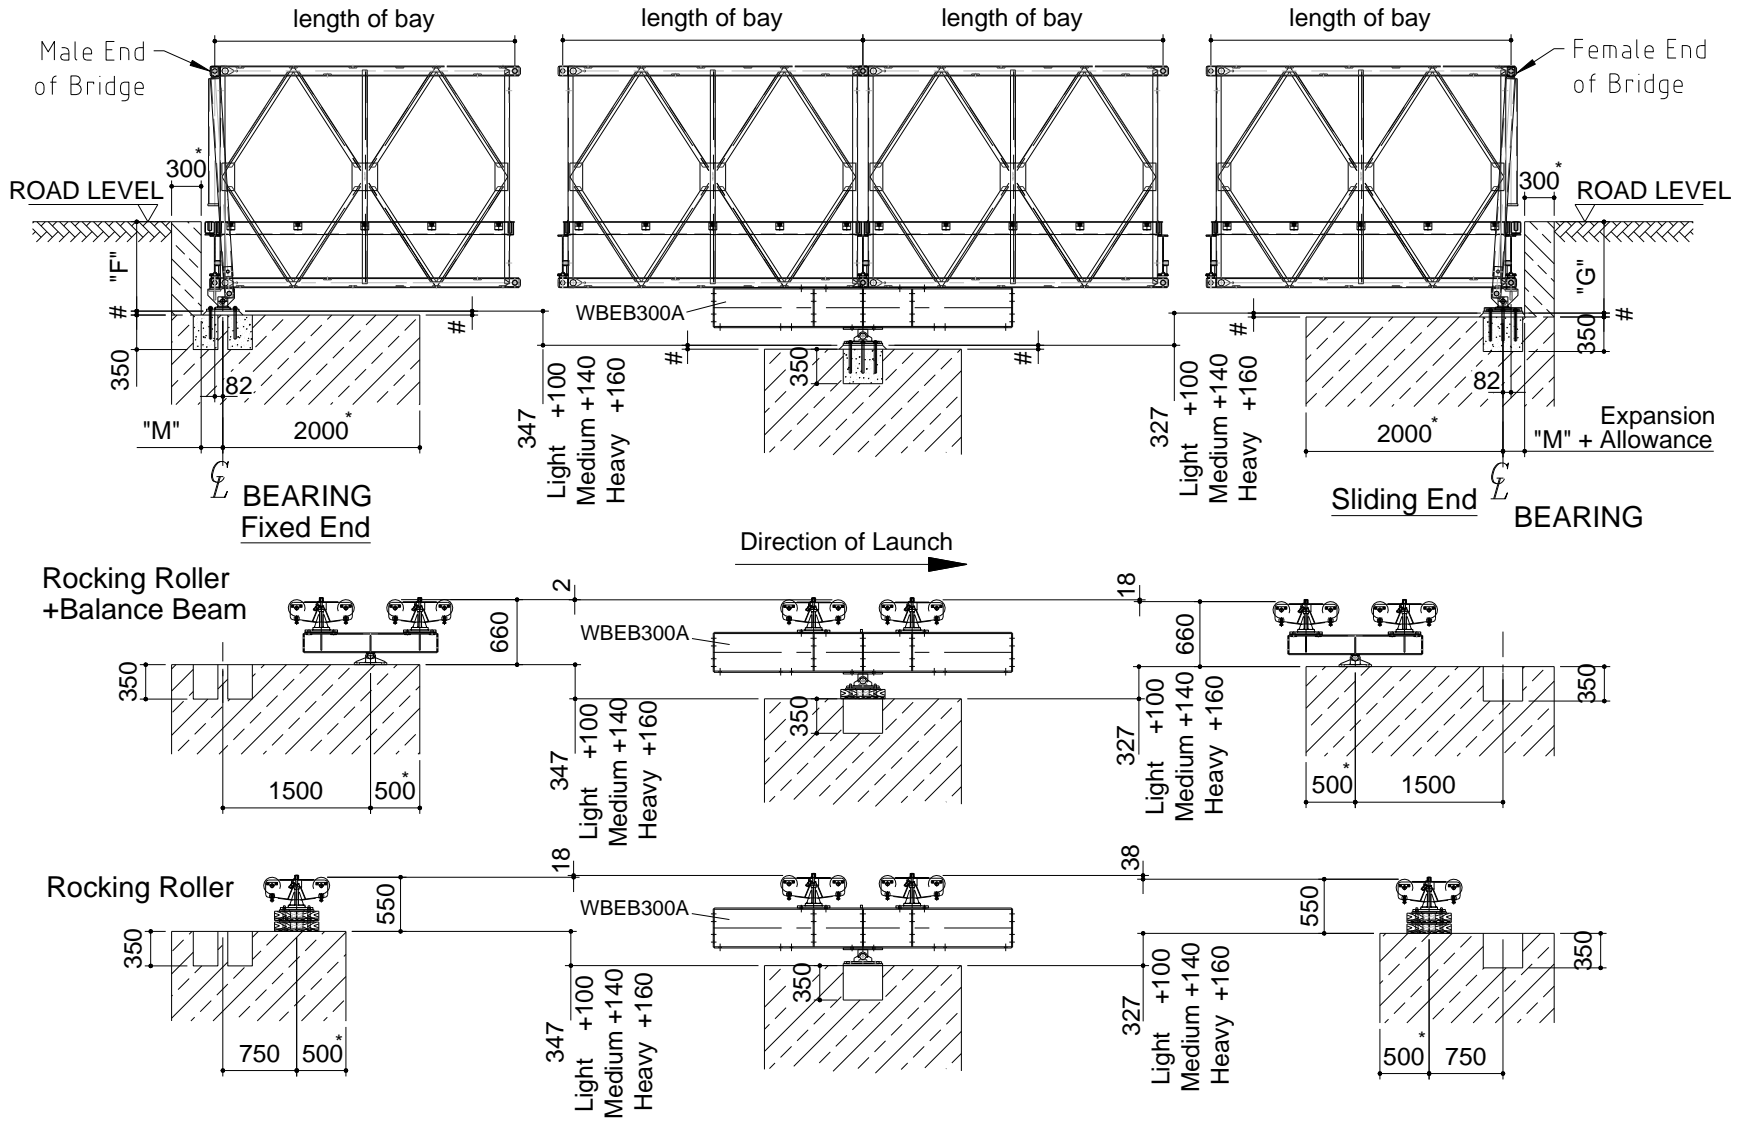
ABUTMENT, BEARING PLATES AND ROLLER LAYOUT FOR SPAN JUNCTION BRIDGES – SIDE VIEW
